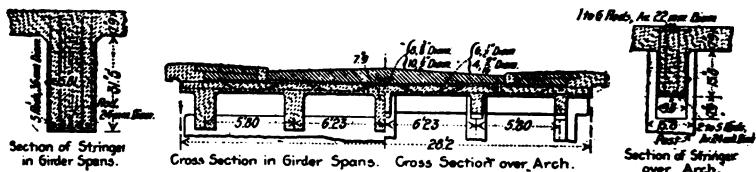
Cross-Section of Roadway, Gruenwald Bridge.
